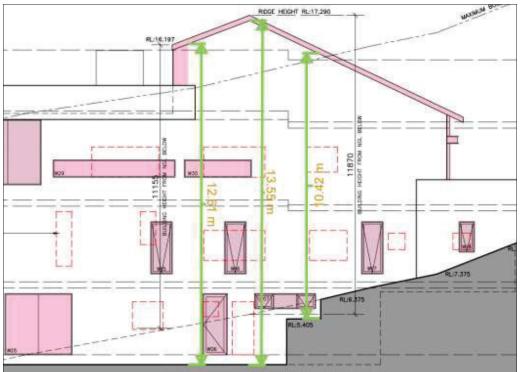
Extract of eastern elevation showing the existing maximum wall plate height (13.55m) and areas of further non-compliance to both the height in storeys and the wall plate height
